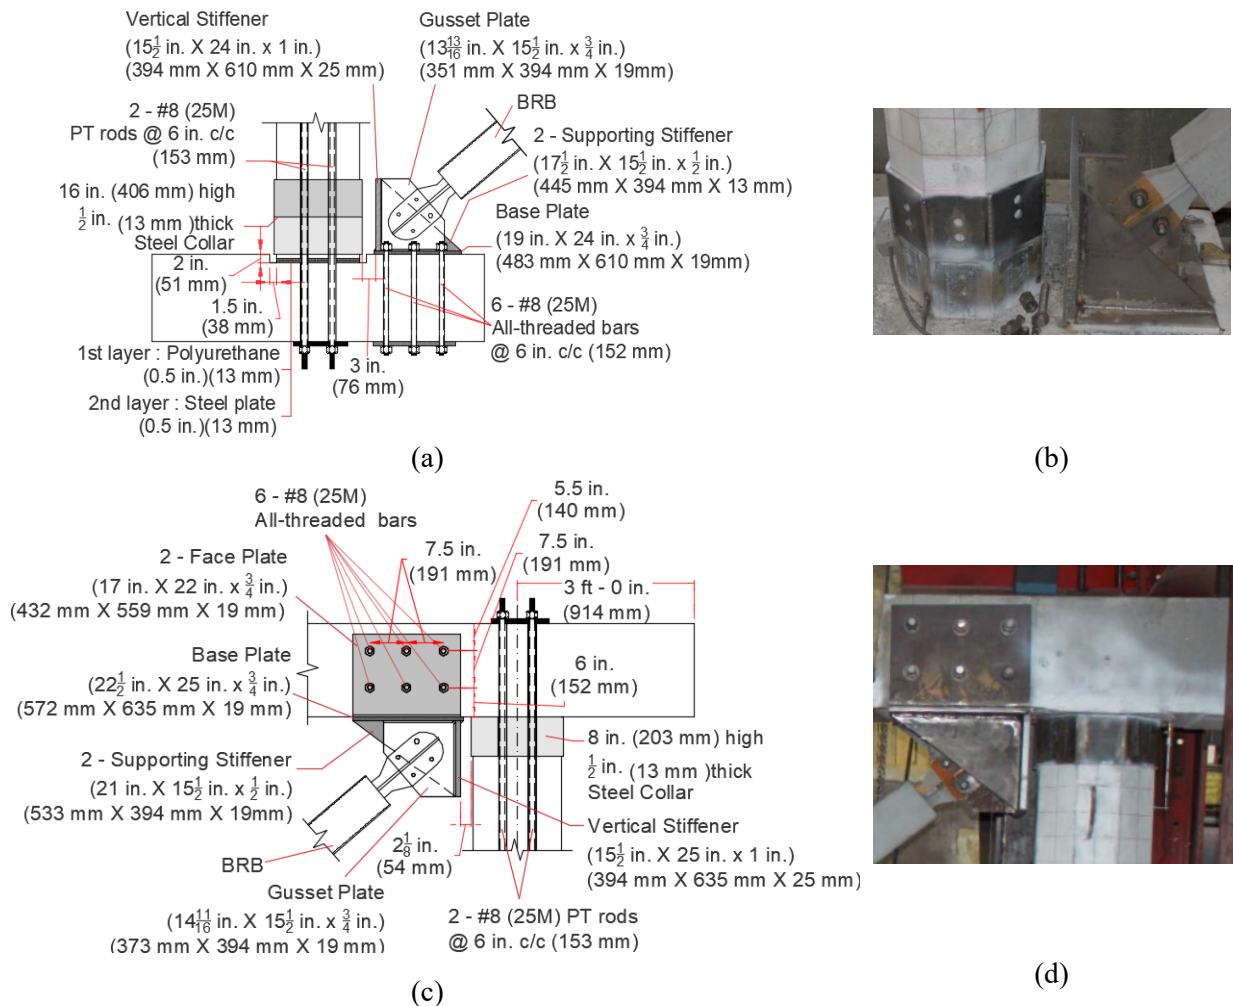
Gusset assemblies: (a) lower gusset assembly details; (b) gap between lower gusset and column; (c) upper gusset assembly details; (d) gap between upper gusset assembly and column
